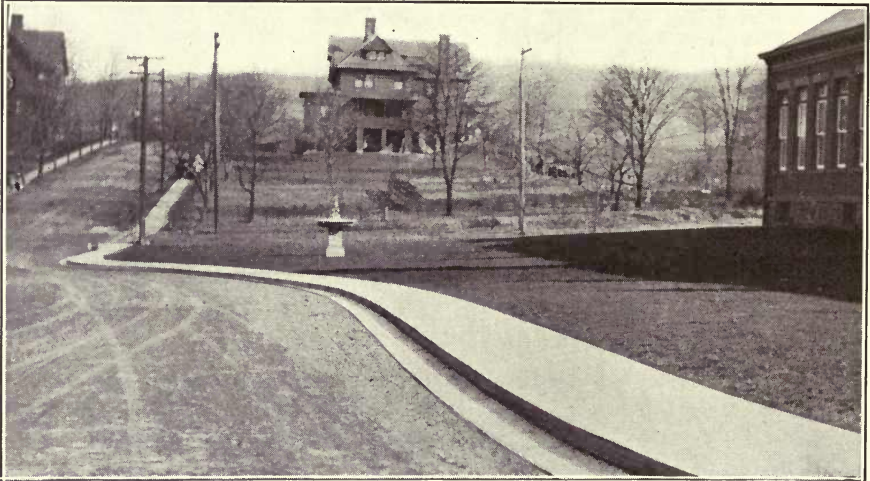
CONCRETE SIDEWALK IN SOUTH BETHLEHEM, PA.
